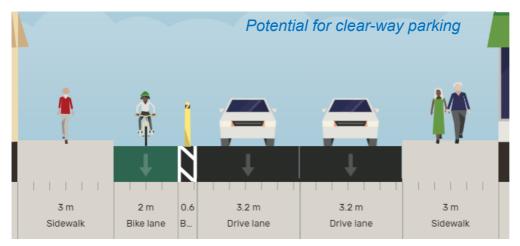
NS-2UA/3UB/3BA Cross section D (looking south)
